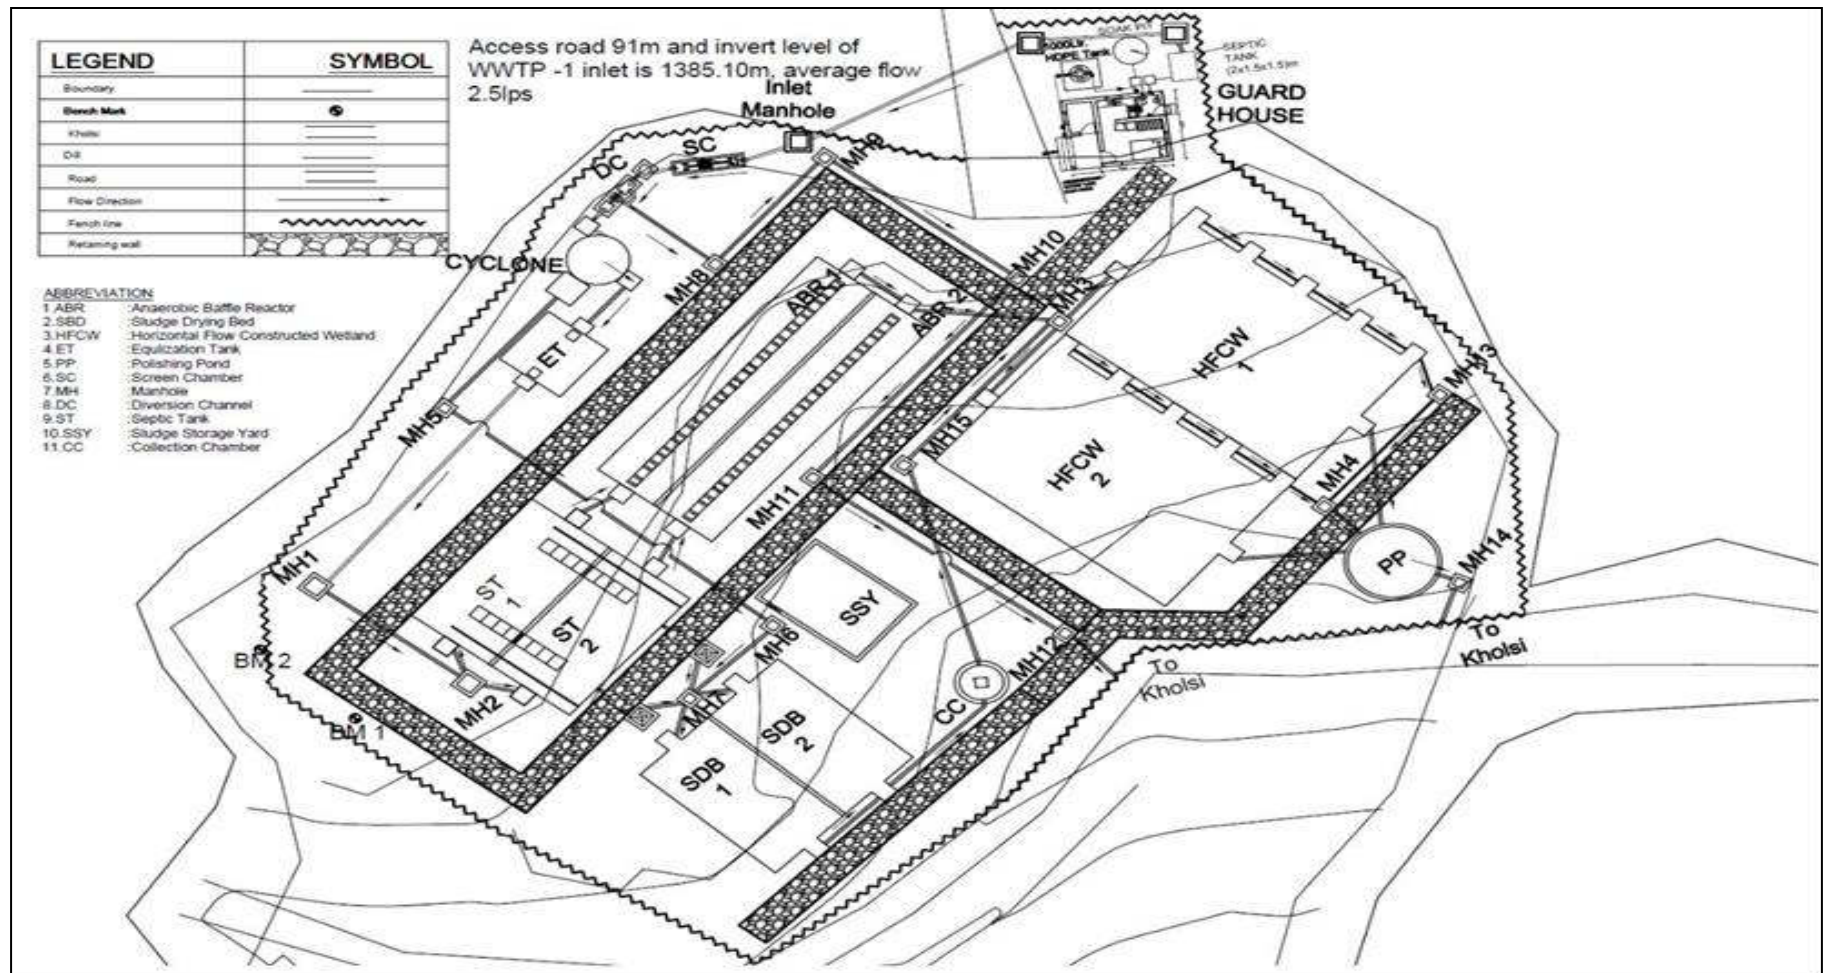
Layout plan of the Proposed WWTP-1 (2.5 lps)
